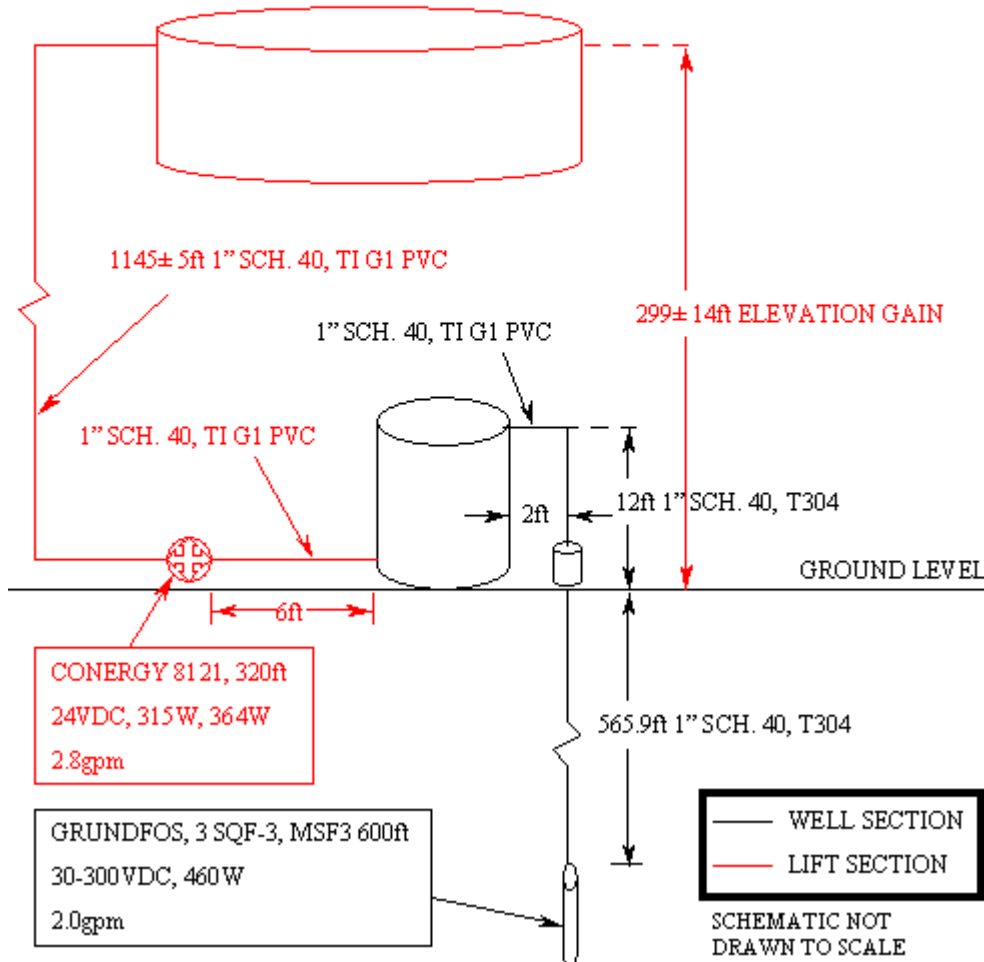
A schematic illustrating the controlling pumps for each section of the system and the length and type of pipe material that will be used in each section. The table lists the type and number of pipe fittings that will be used in each section.
